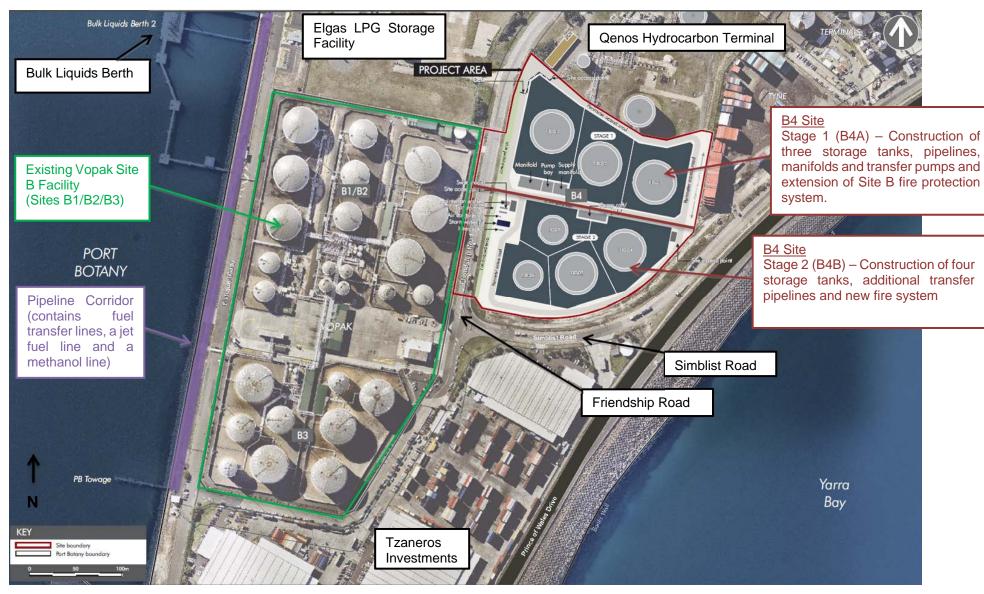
Proposed Development (highlighted in red) and the Site B Facility
